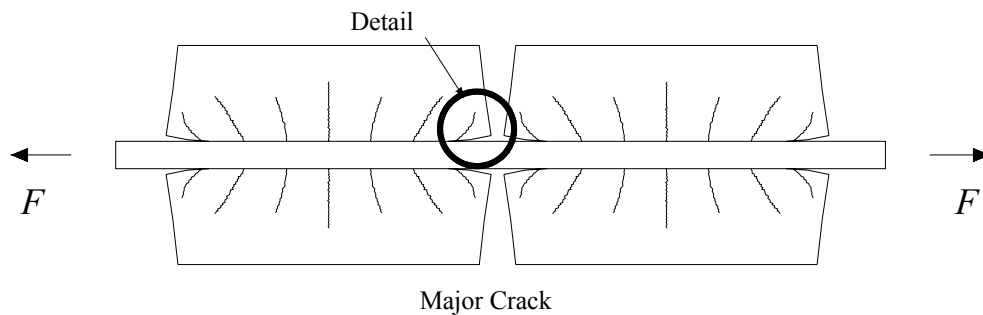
Deformed concrete between transverse cracks of a tension member
